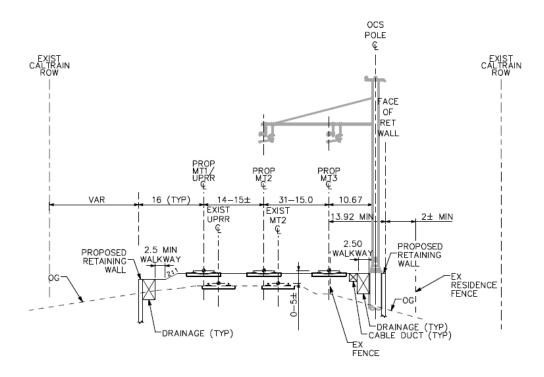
Typical Section South of I-280 in Subsection San Jose Diridon Station Alternative 4
